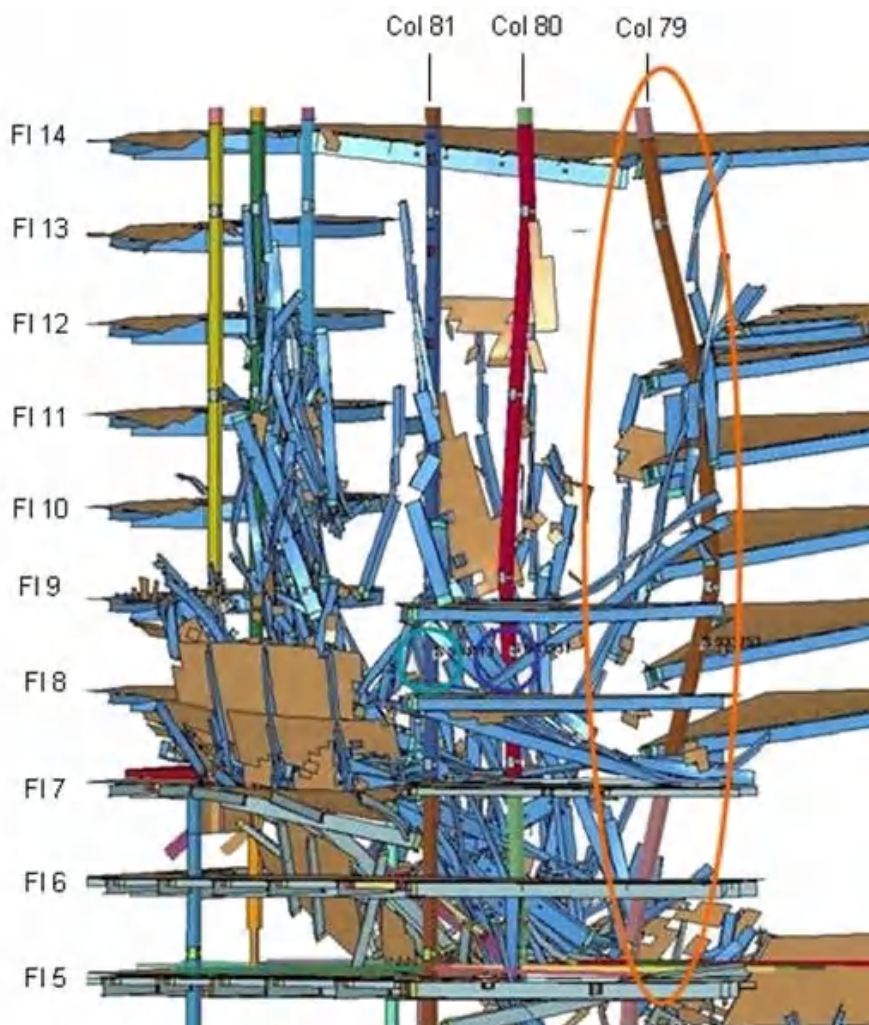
Column buckling (NIST Building and Fire Research Laboratory).
